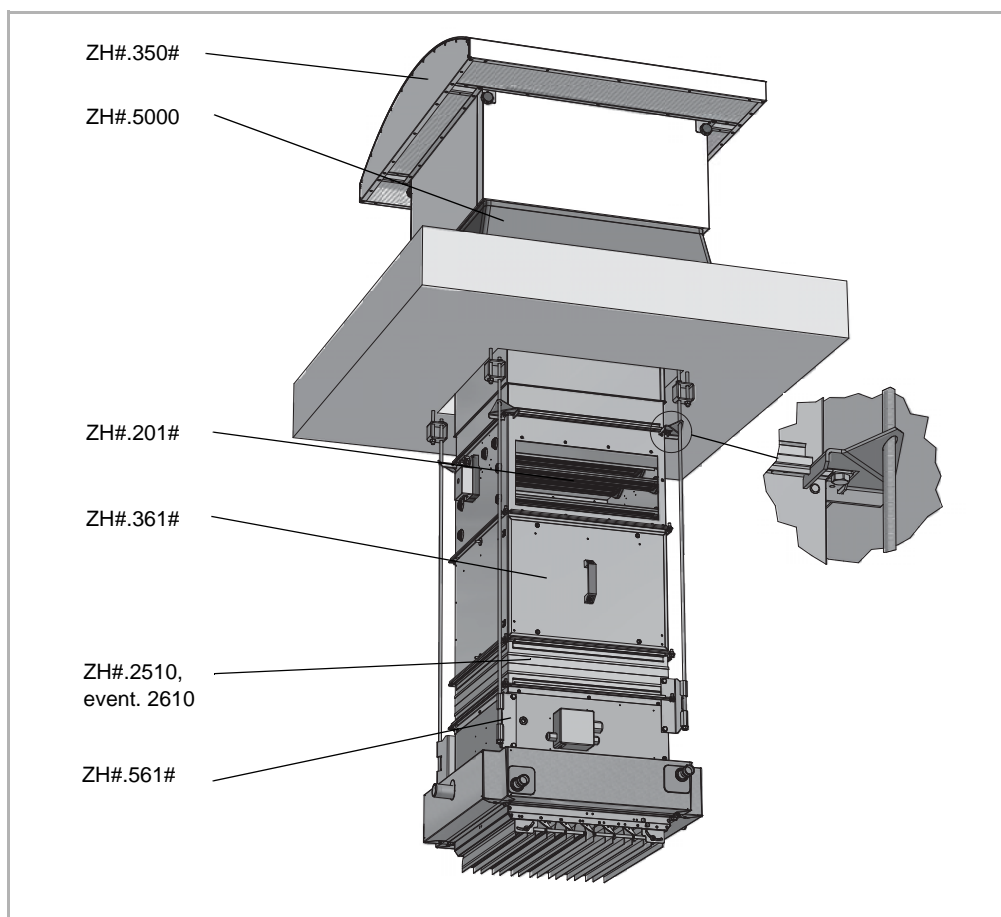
Ceiling mounting of a mixed air unit with „ceiling“ suspension (ZH#.560#)
